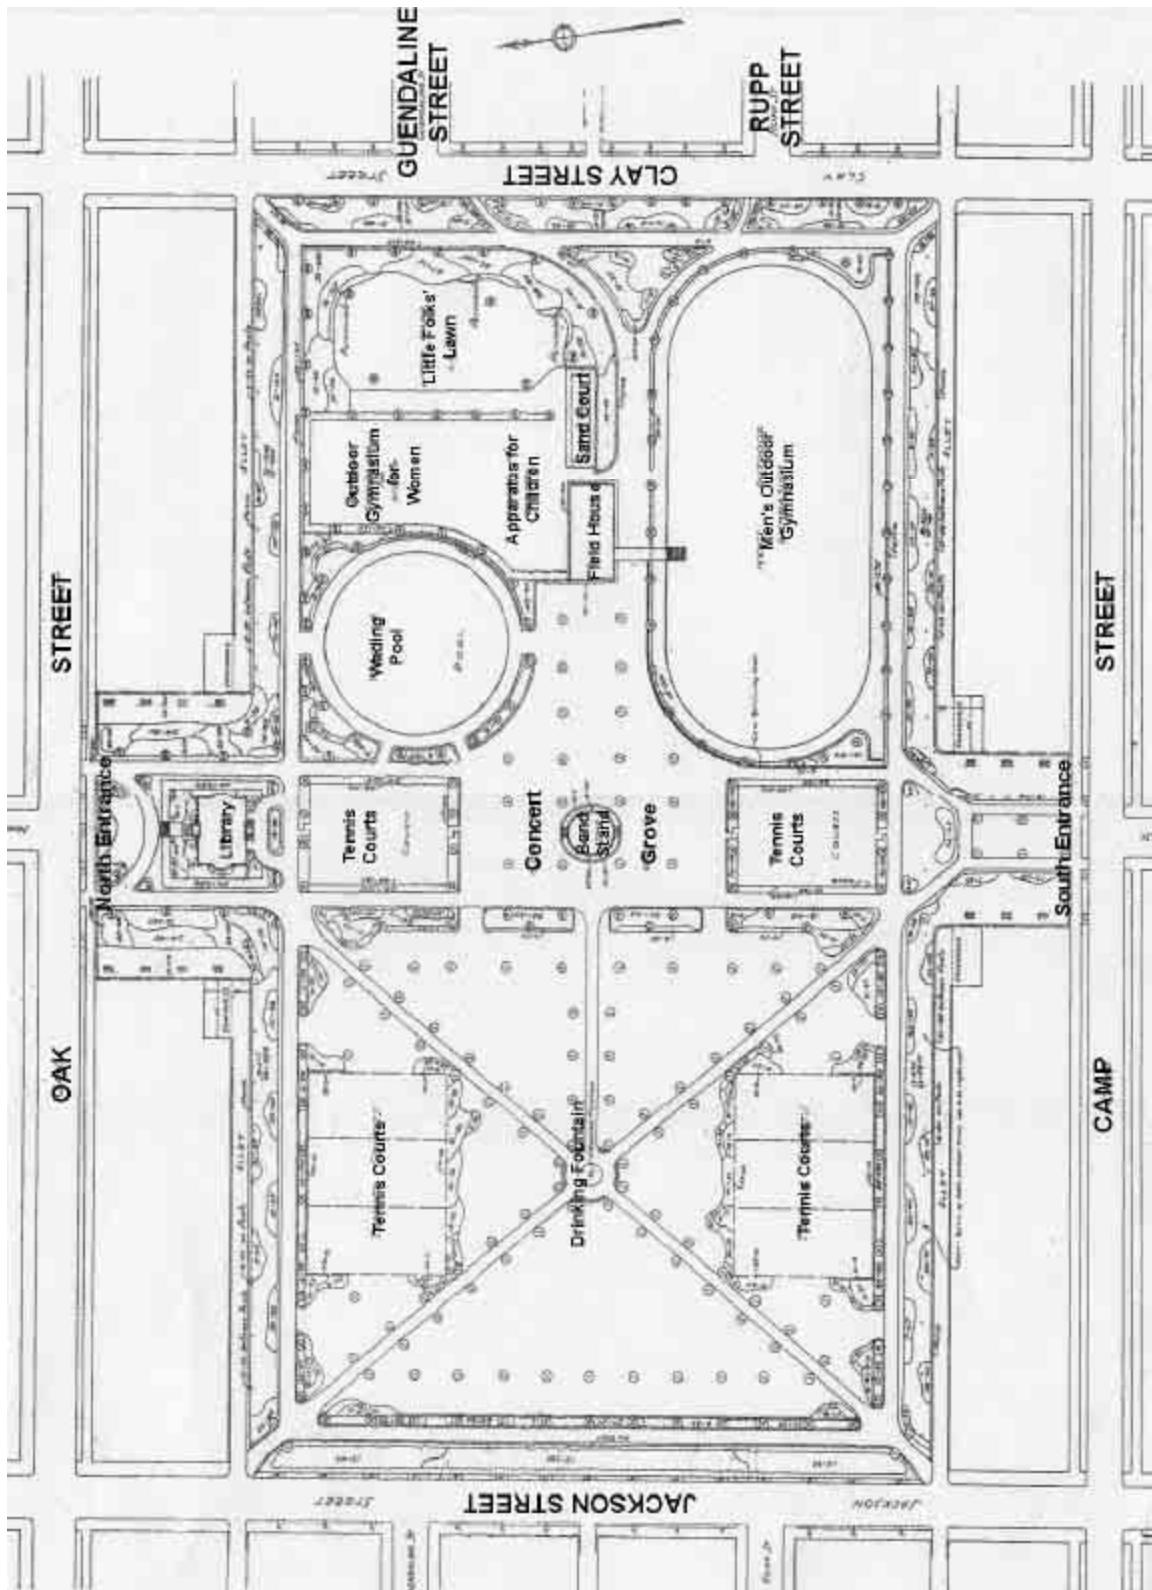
1911 revised plan for Shelby Park. After close analysis, this plan appears to be the one used in construction of the park.
